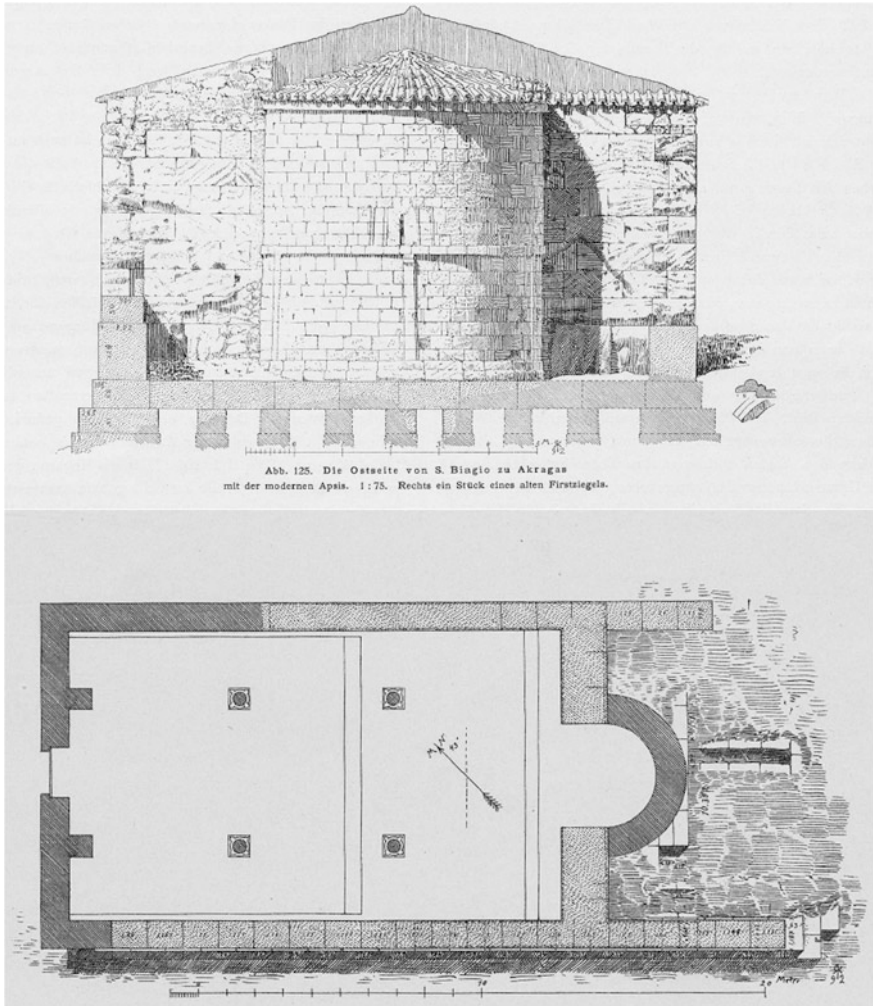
Elevation (*above*) and plan (*below*) of the Norman church of San Biagio (from Koldewey and Puchstein 1899)
